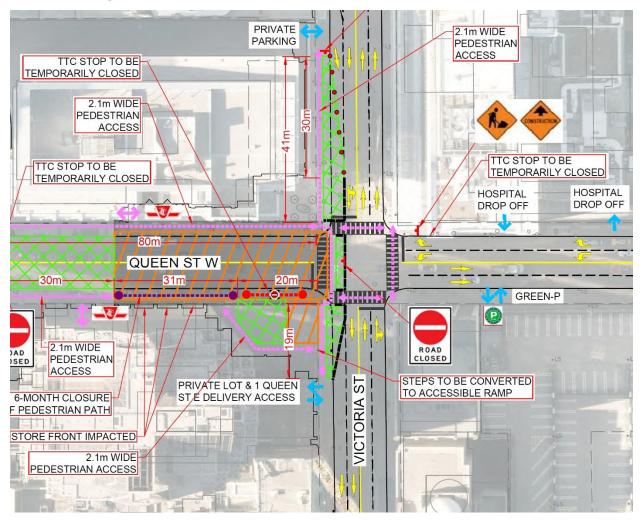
Victoria Street Laydown | Access & Parking Impacts
